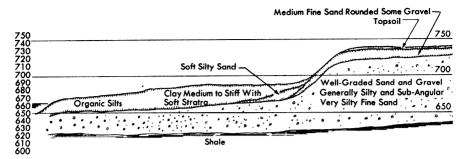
Soil profile in northwest-southeast direction east of building area.
